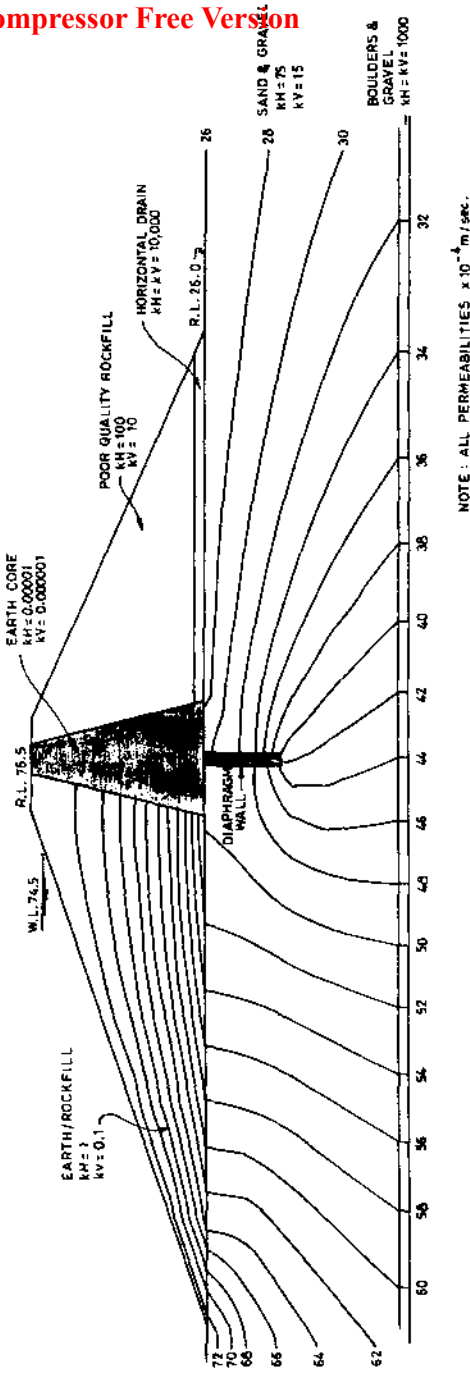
Seepage equipotentials Lungga Dam, uniform foundation (Coffey & Partners 1981).
